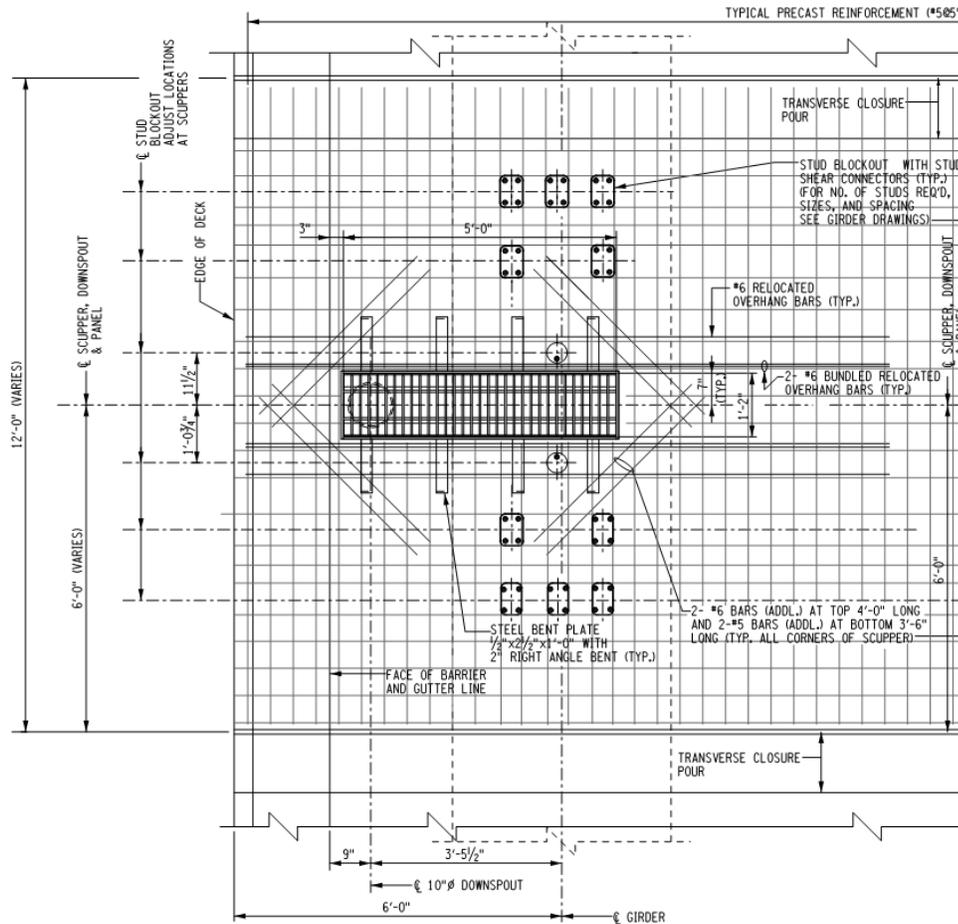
Partial plan view of typical deck panel showing shear connector pockets
